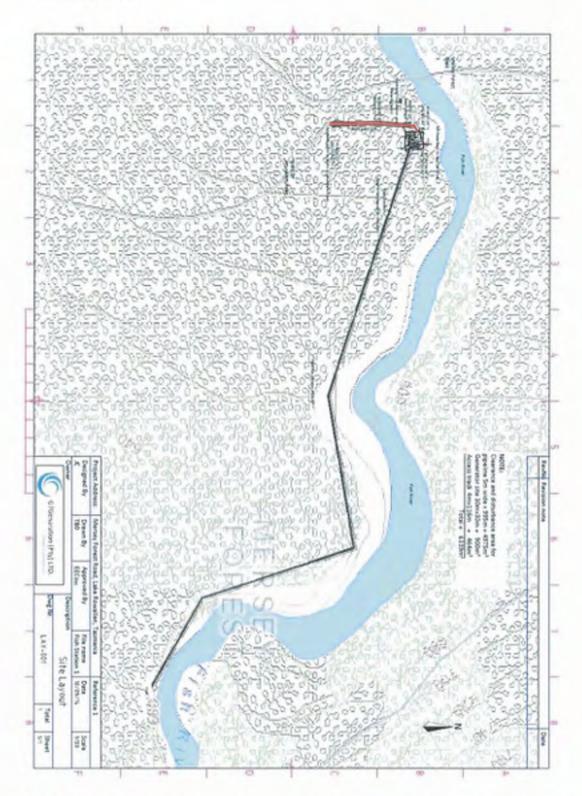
Site plan illustrating proposed power station site, penstock pipe and intake location.
